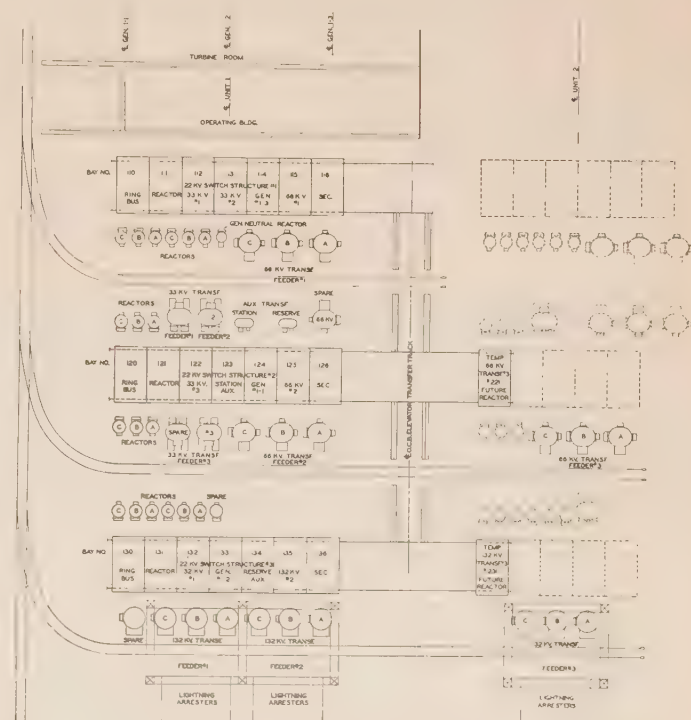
GENERAL ARRANGEMENT OF 22-Kv. SWITCHYARD—STATE LINE STATION
